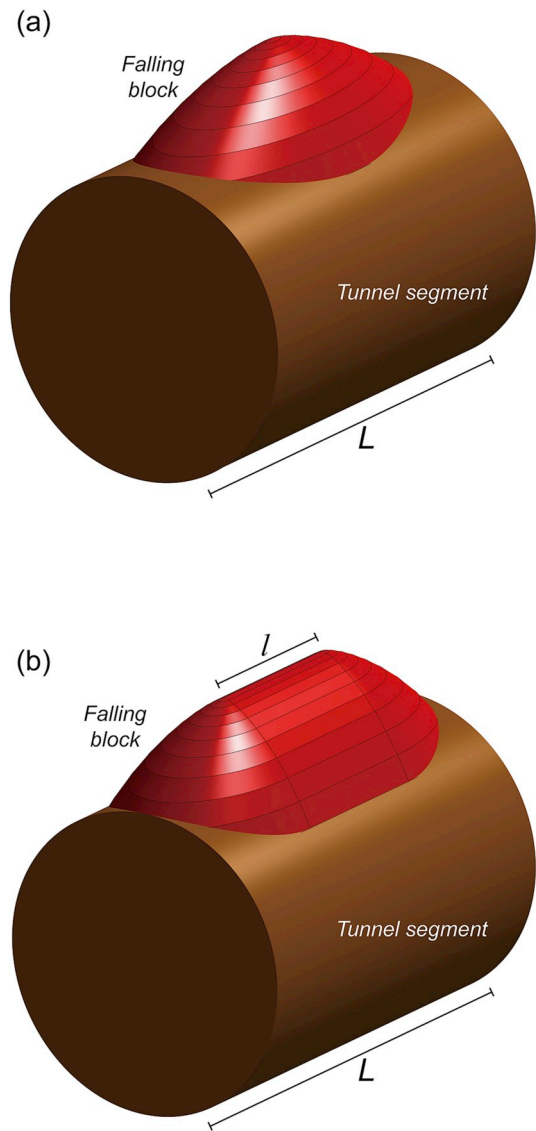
A schematic of 3D roof failure surfaces: (a) right elliptic cone block intersecting the circular cross-section tunnel, and (b) right elliptic cone with a prismatic insert.
